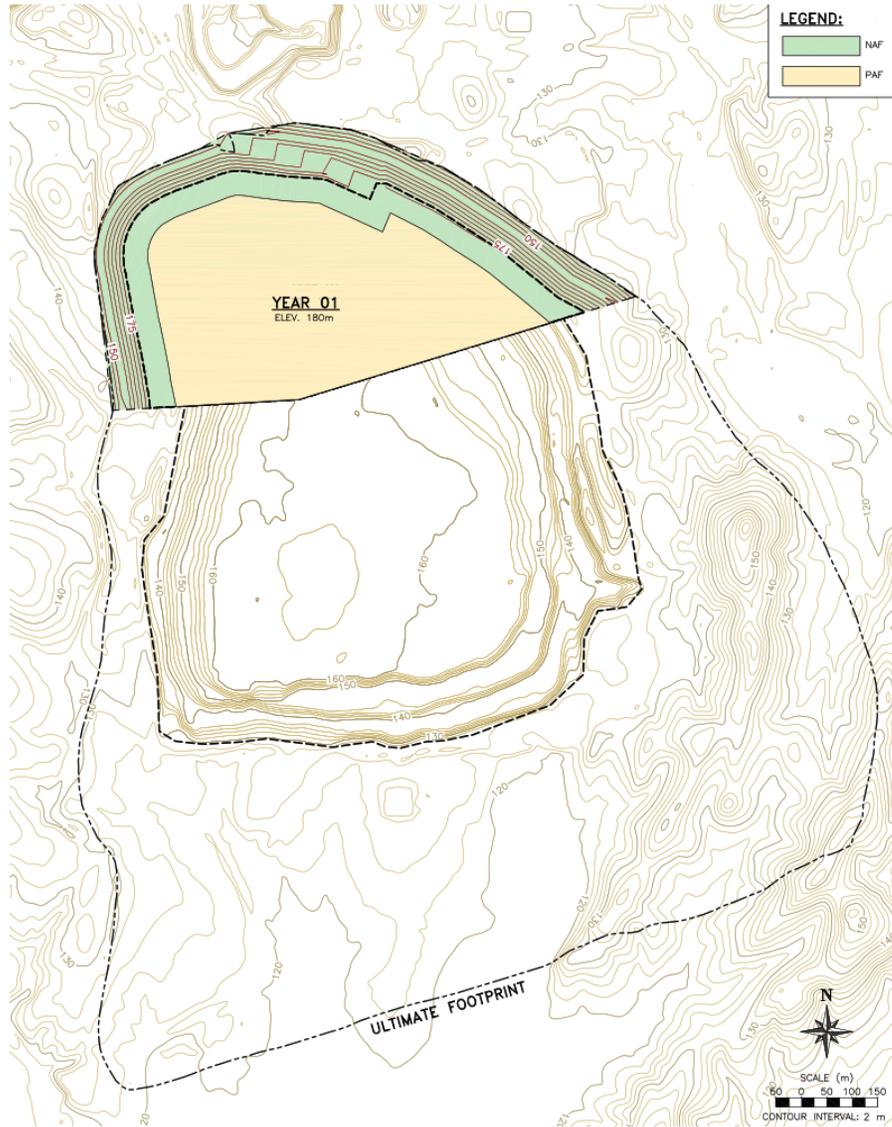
Year 1 of WRD Construction, Tierra Group August 2025
